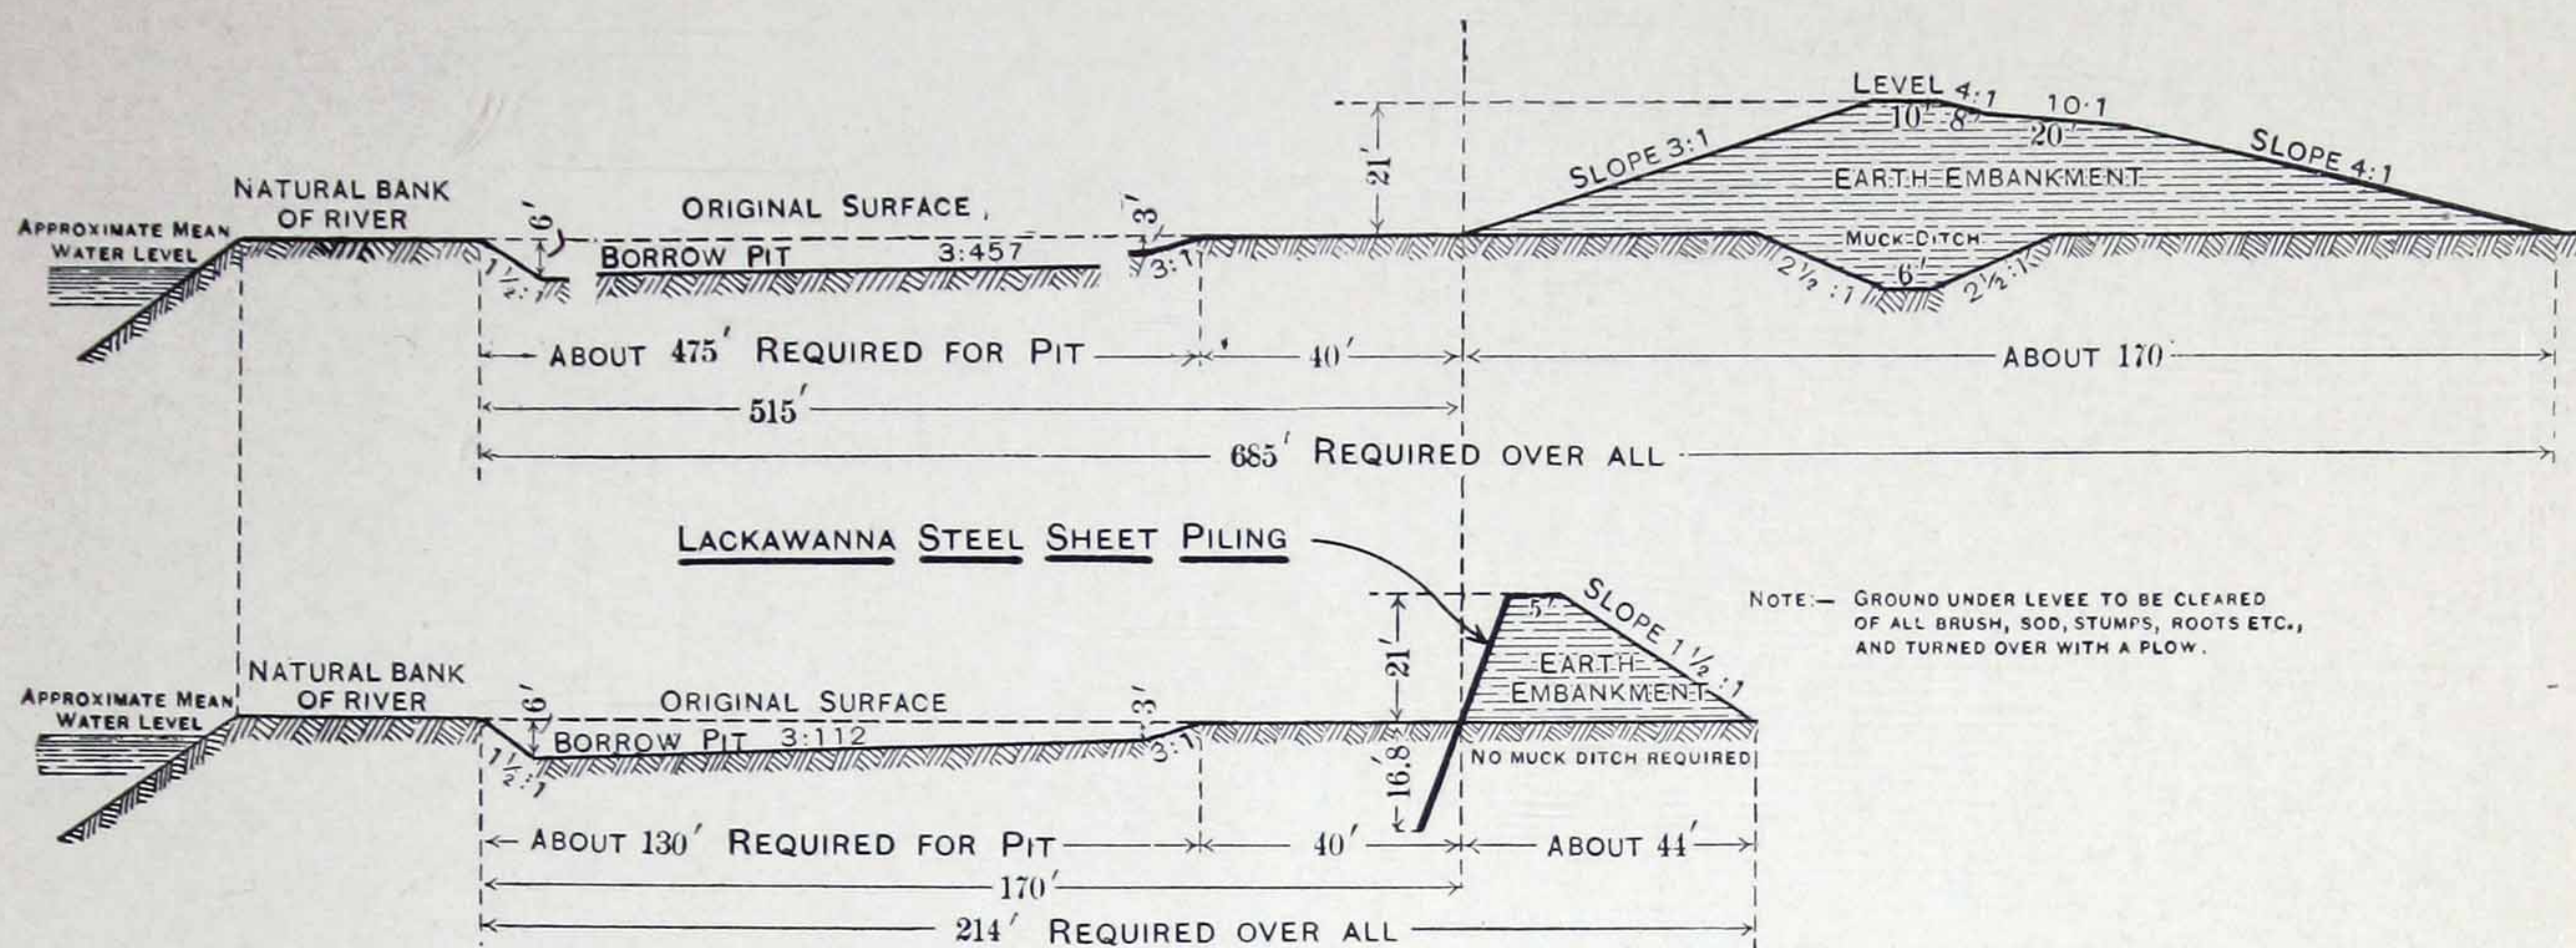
Cross-sectional comparison of typical earthen levee 21 feet in height, developed from standard sections, with levee of tentative design for same service and based upon the use of Lackawanna Protected-Steel Sheet Piling. In the latter design, the steel sheet piling wall forms a watertight facing on the water side of the levee and a cut-off wall below the same, preventing seepage and percolation through or under the embankment.
